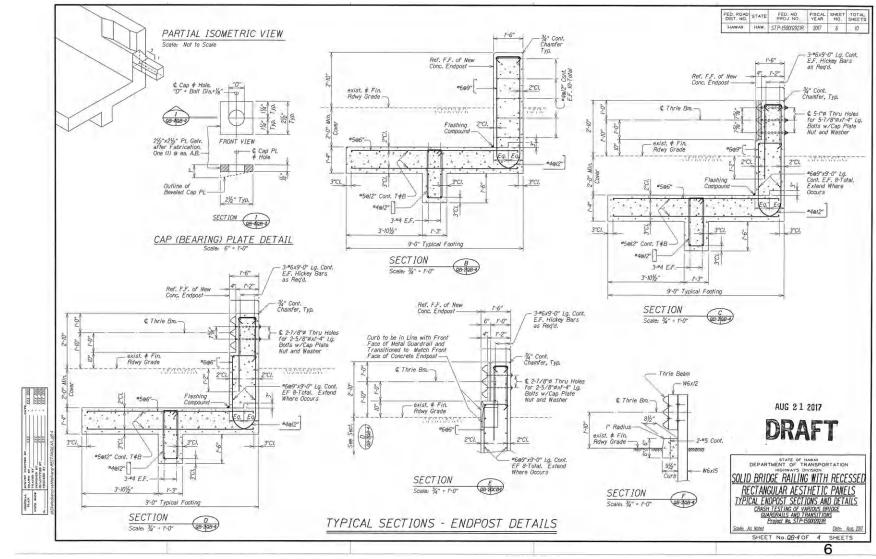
HDOT Standard Detail for the 34-in. Tall, Aesthetic Concrete Bridge Rail
